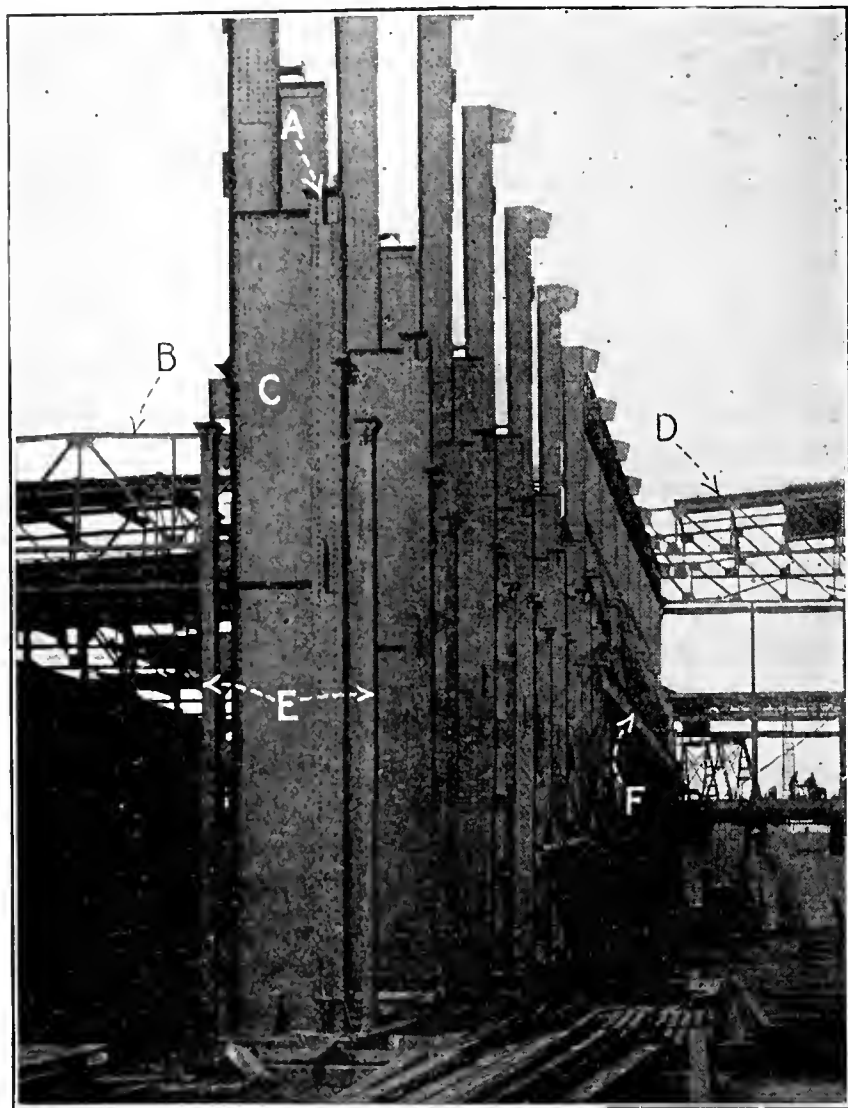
HEAVY COLUMNS FOR 250-TON 86-FOOT CRANE IN RAILROAD REPAIR SHOP
